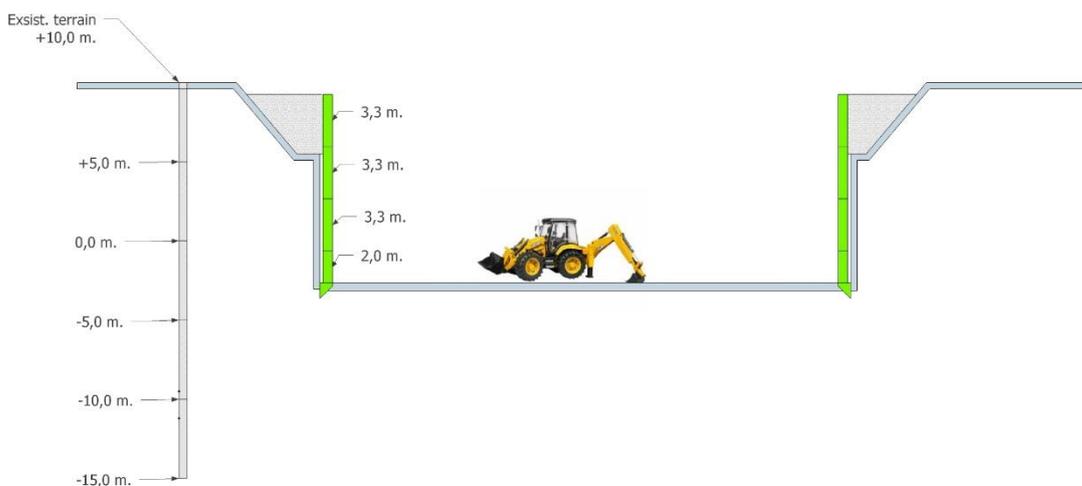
Step 2: Casting of walls and undercutting of the tank construction.
